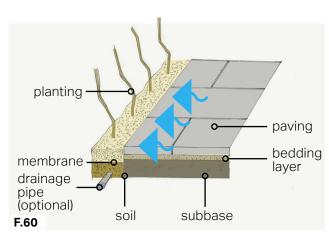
Diagram illustrating the functioning of a stormwater planter.
